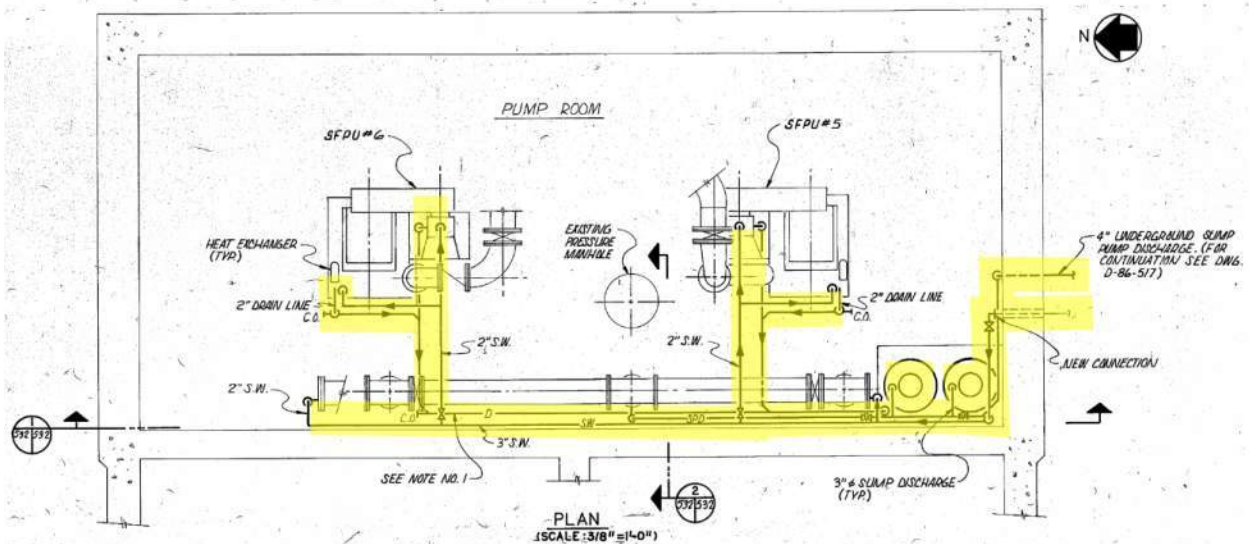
SSTS 5/6 Pump Room Seal Water, Drain Piping, and Sump Pump Layout
